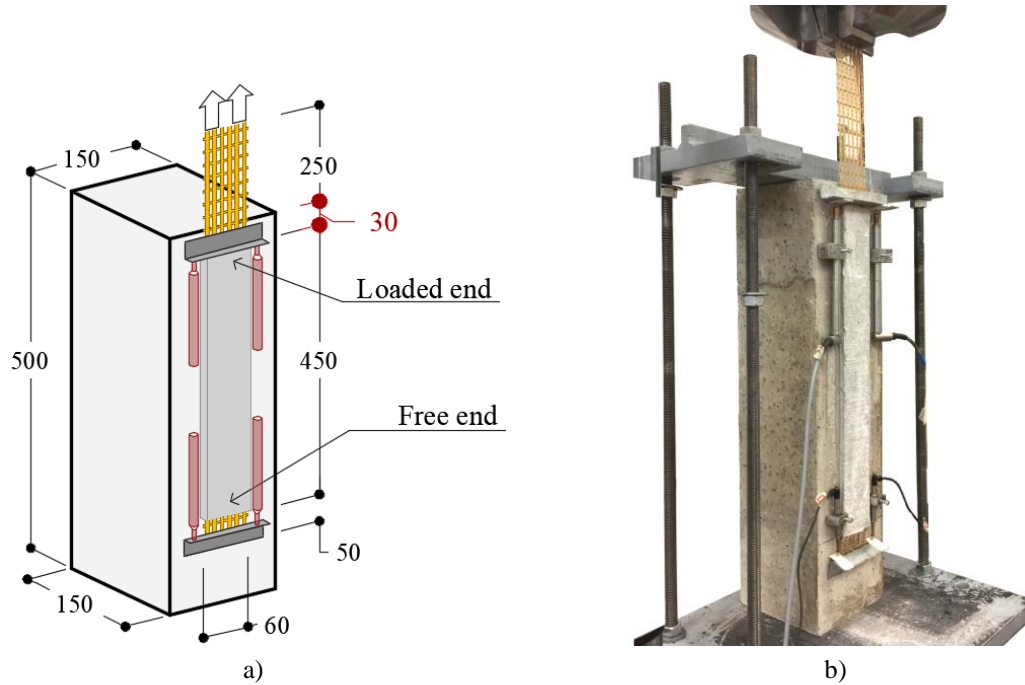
a) specimen geometry (dimensions in mm); b) test set-up.
